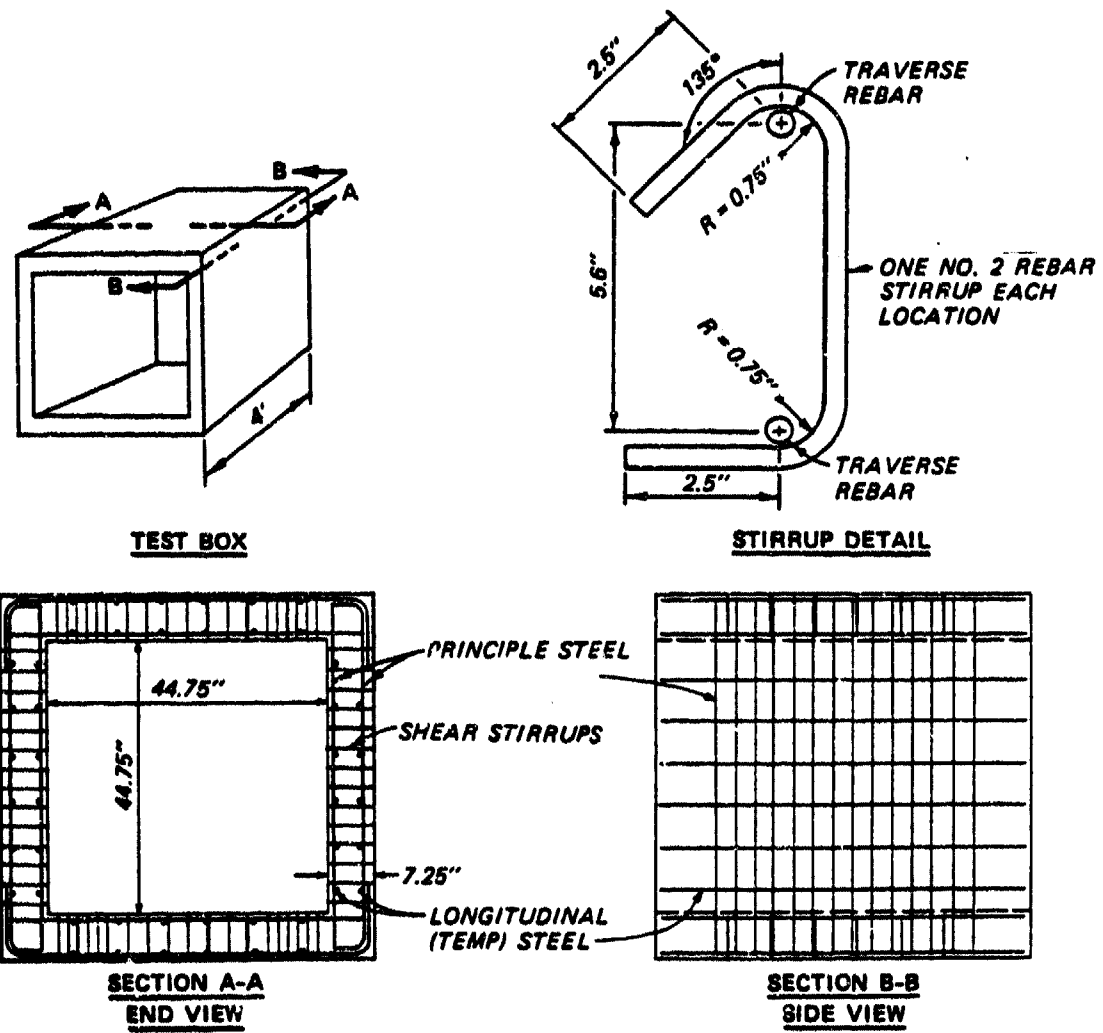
Test Element Construction Details, Test Groups II & III (Kiger'82)
